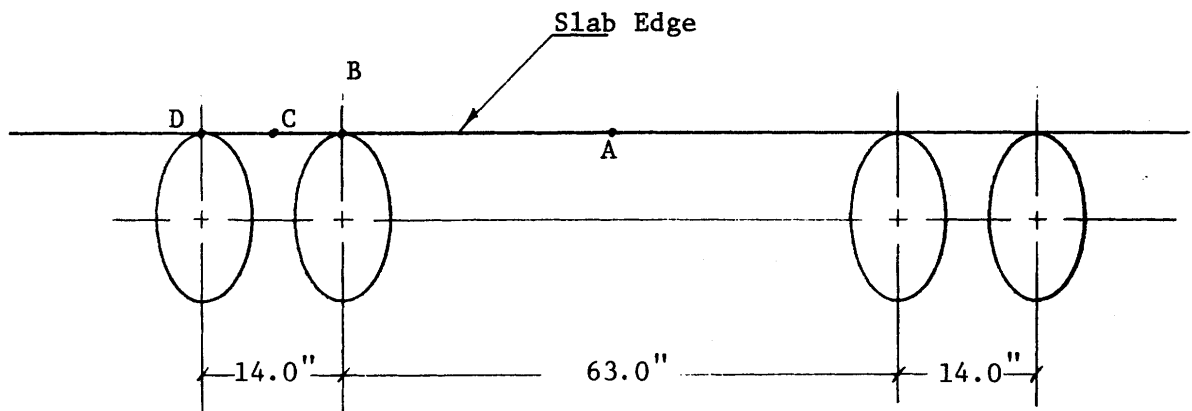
Layout of truck axle load at transverse joint and at longitudinal edge joint.
